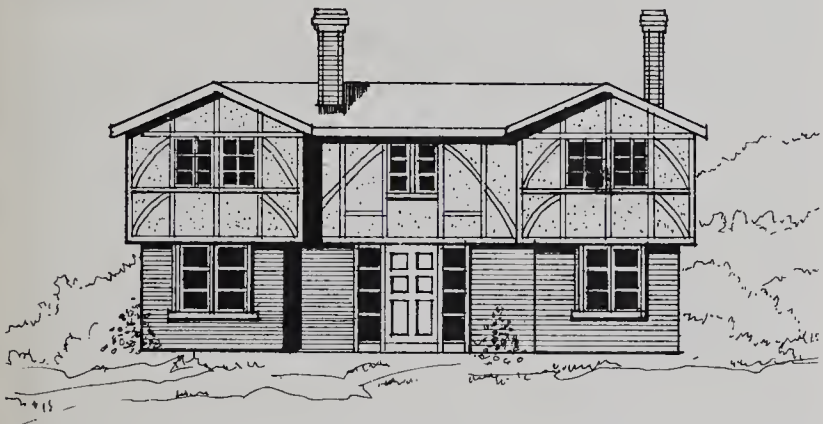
A house in the Tudor or half-timbered style. The first floor was often constructed of brick but sometimes of stone
